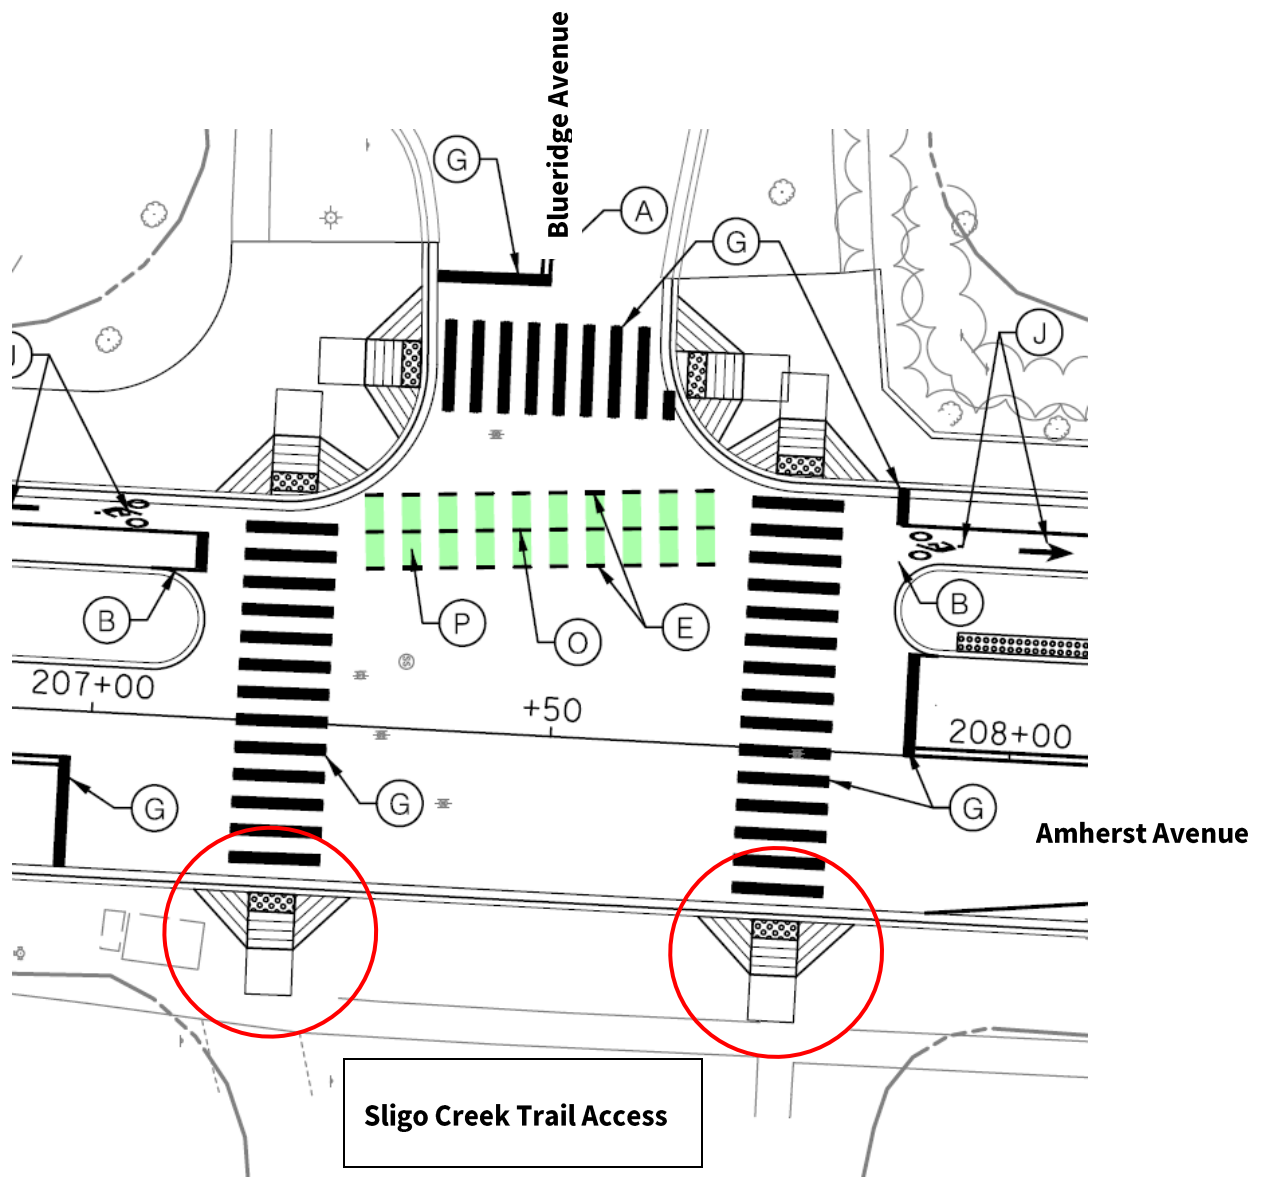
Curb ramp locations at Bluebridge Avenue that should be widened (light grey lines reflect existing conditions, dark lines represent proposed changes)
